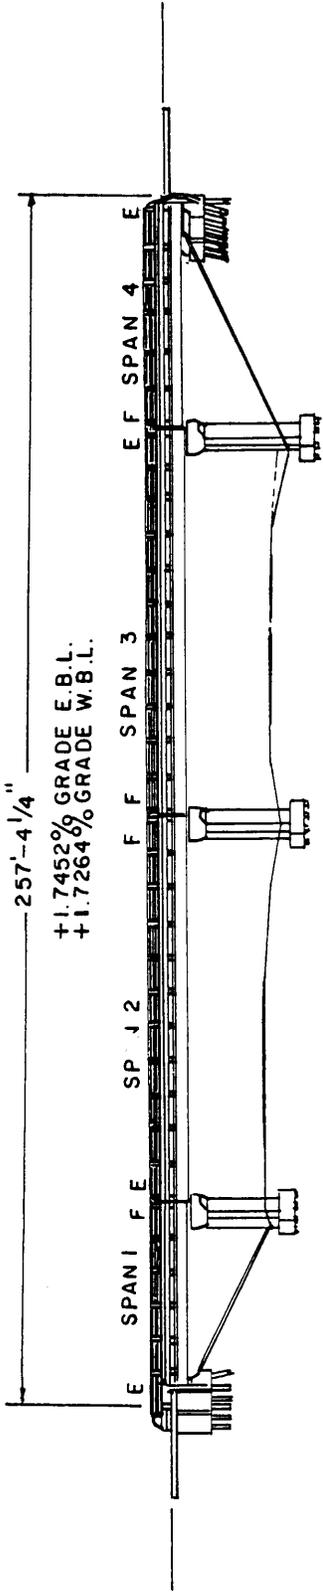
Plan for bridge #4; also shown are the locations of test samples.
